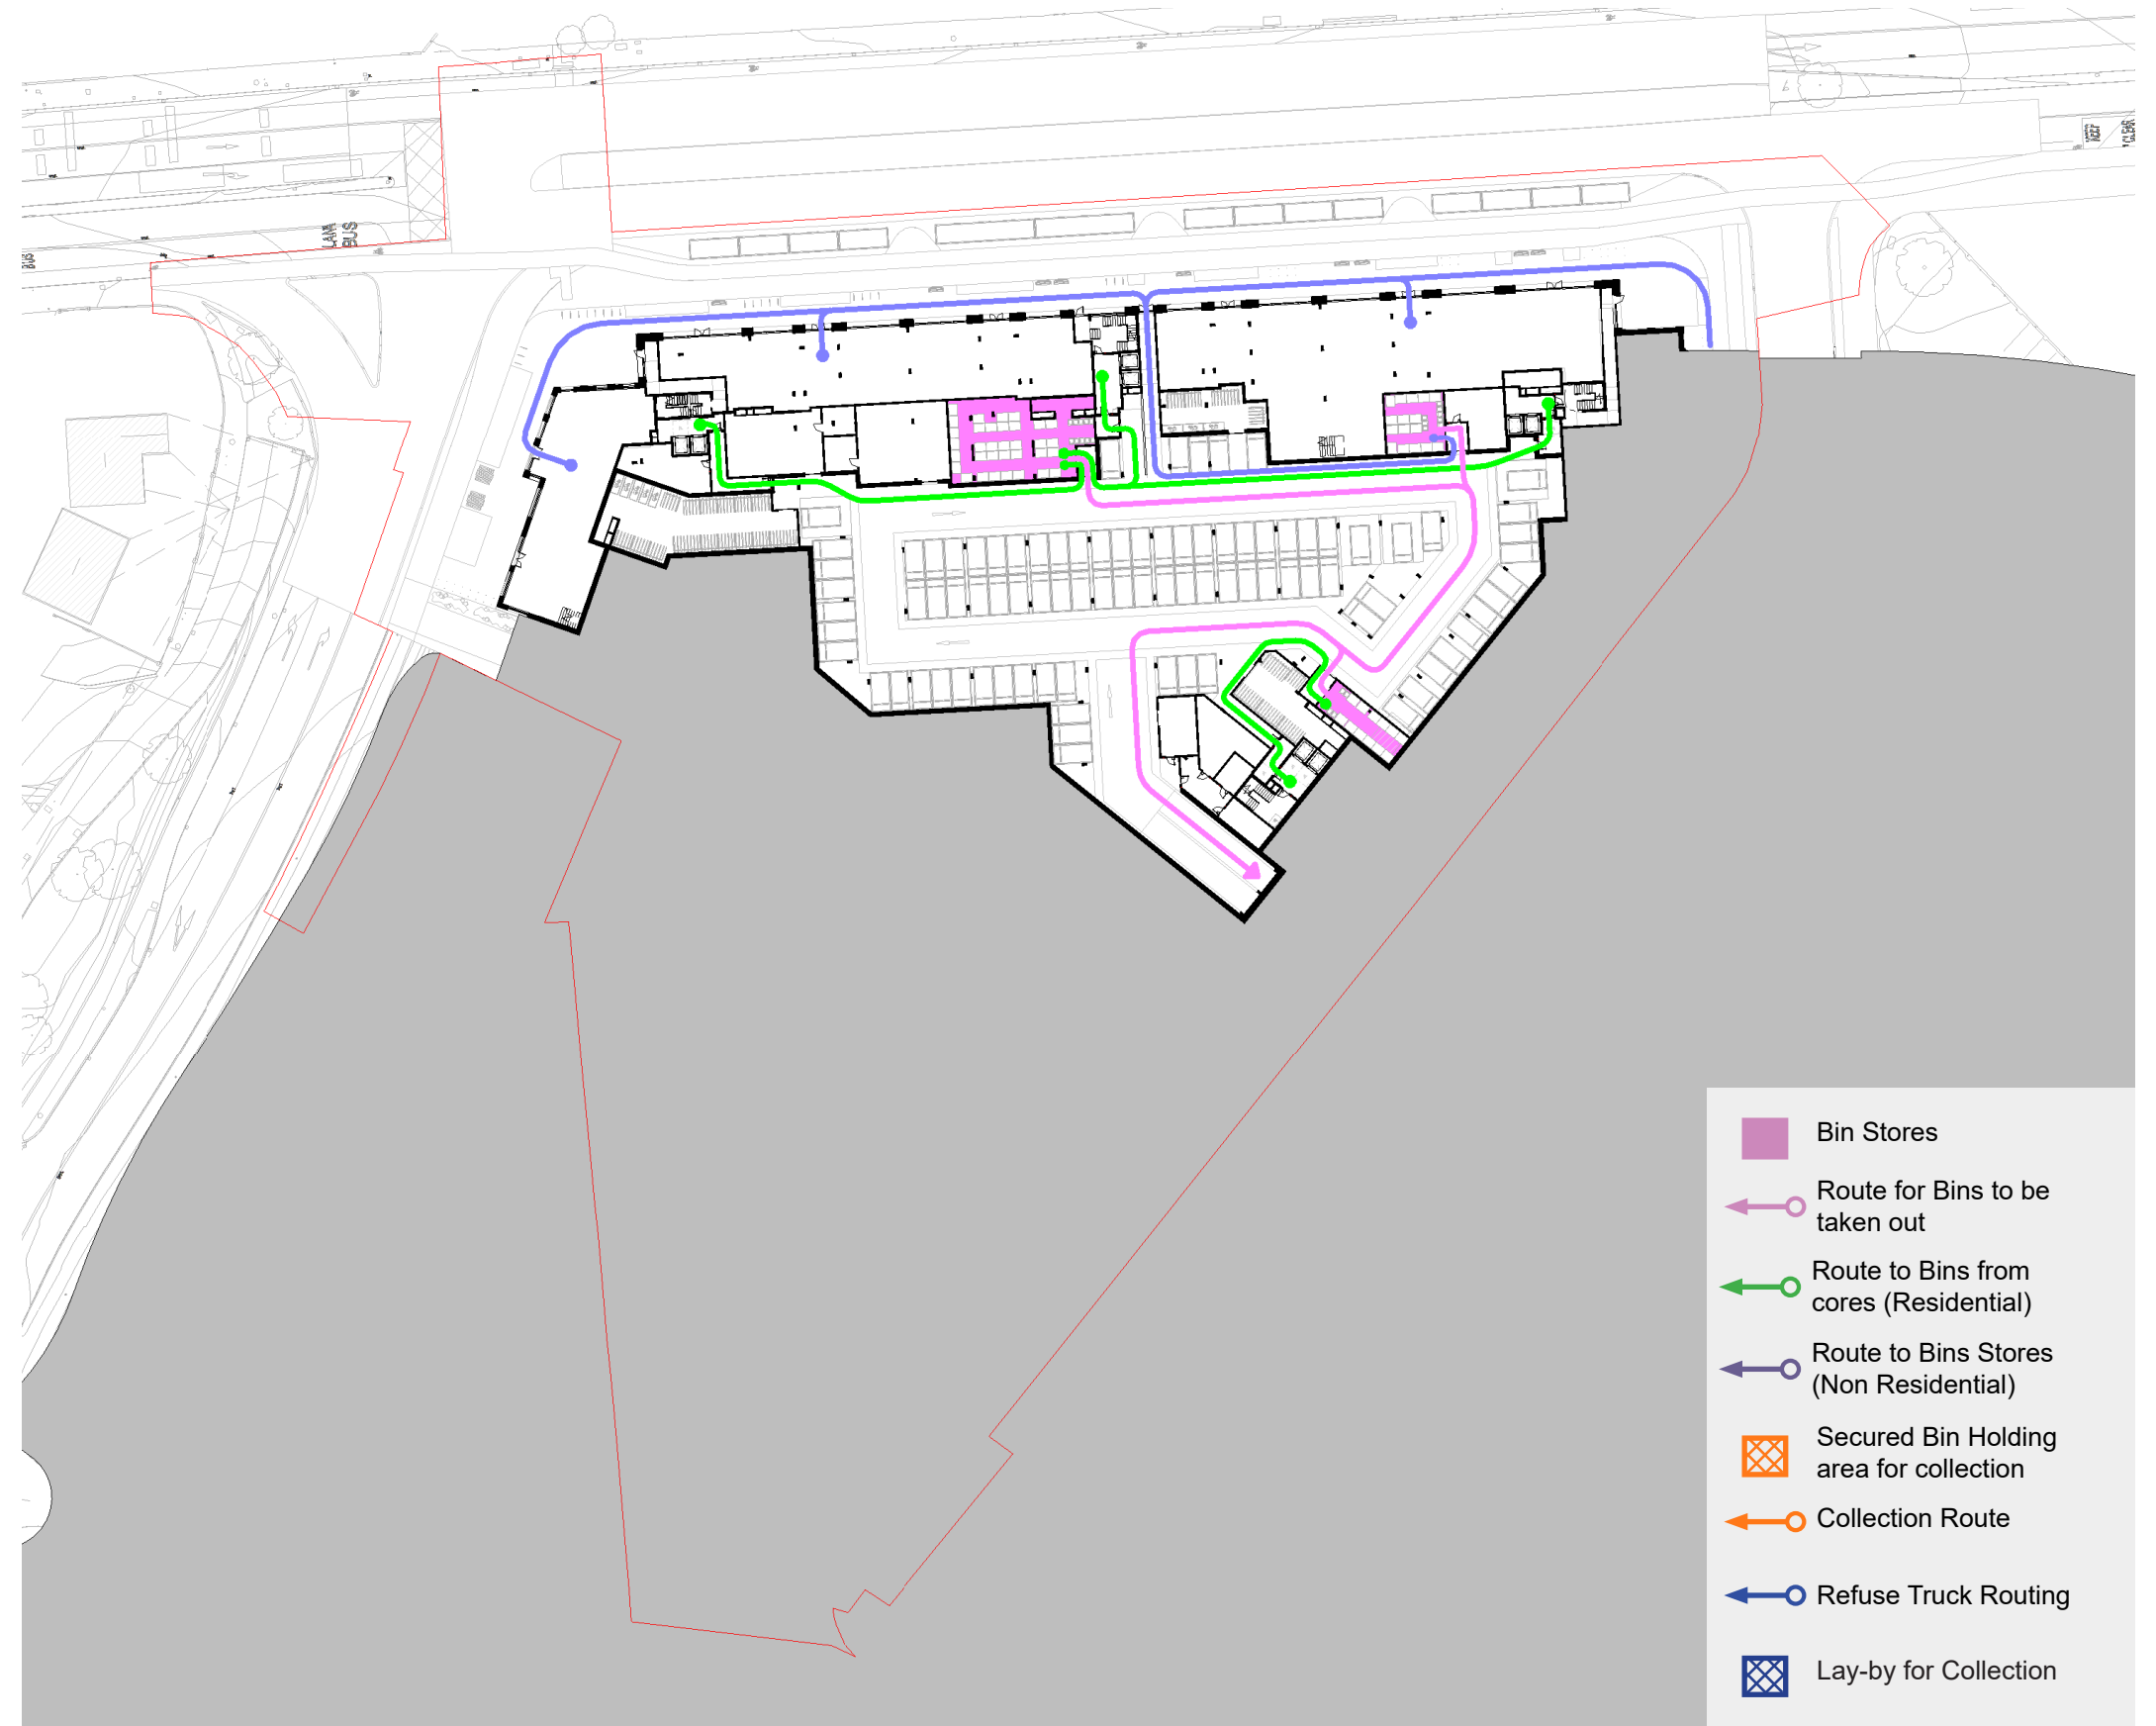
Lower Ground Floor Plan showing waste storage areas for Buildings A, B & C
